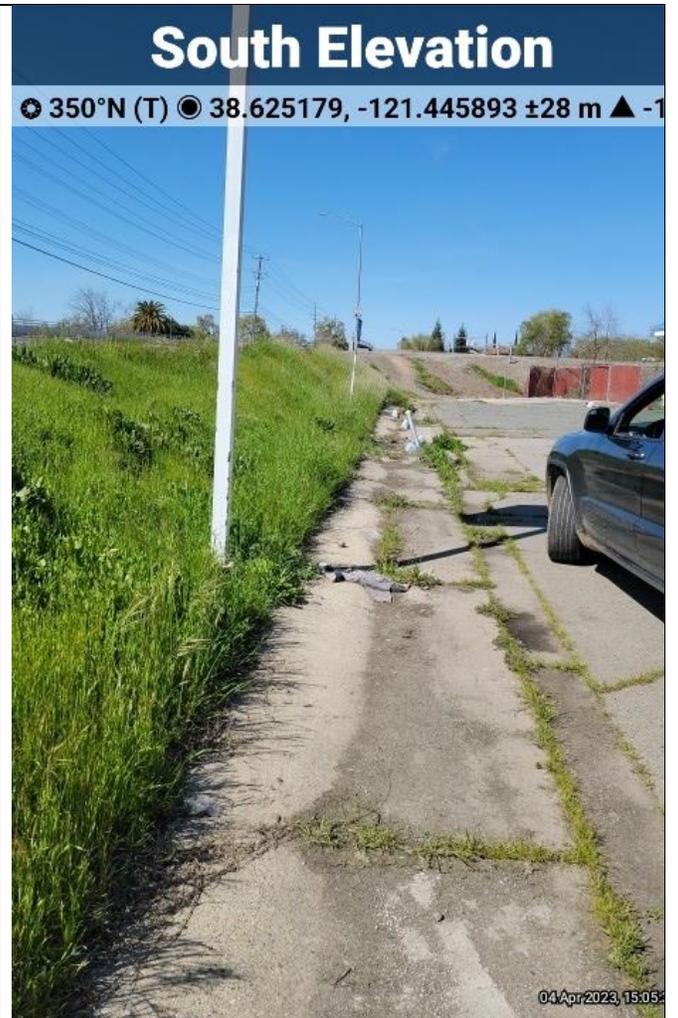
Concrete swale conveys stormwater from west side of Site to storm drain on Arcade Blvd, south of site. View north.
